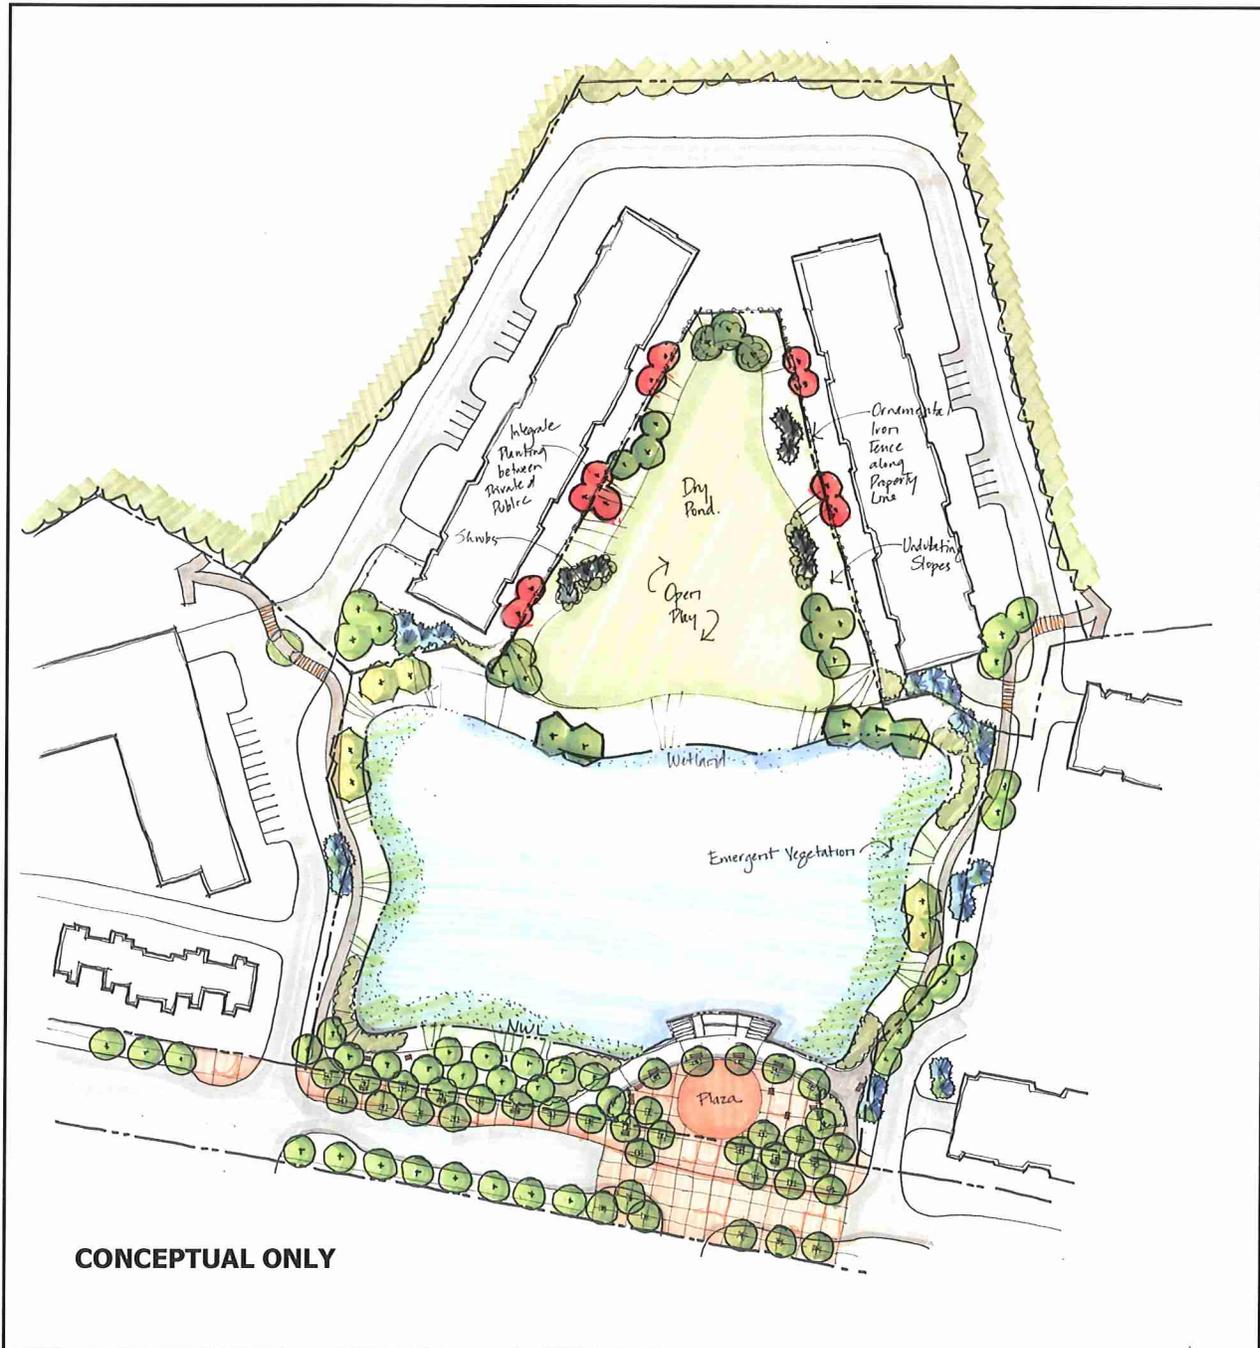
CONSTRUCTED WETLAND CONCEPT PLAN
